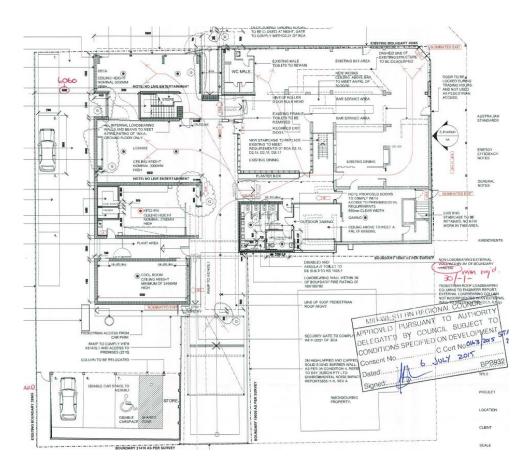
Parking Plan – Excerpt CC 0163/2015 Stage 2
